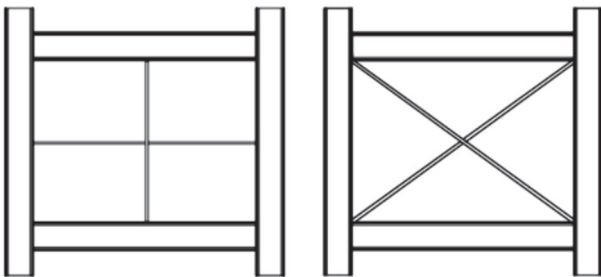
Schematic diagram of steel plate wall with stiffening rib
